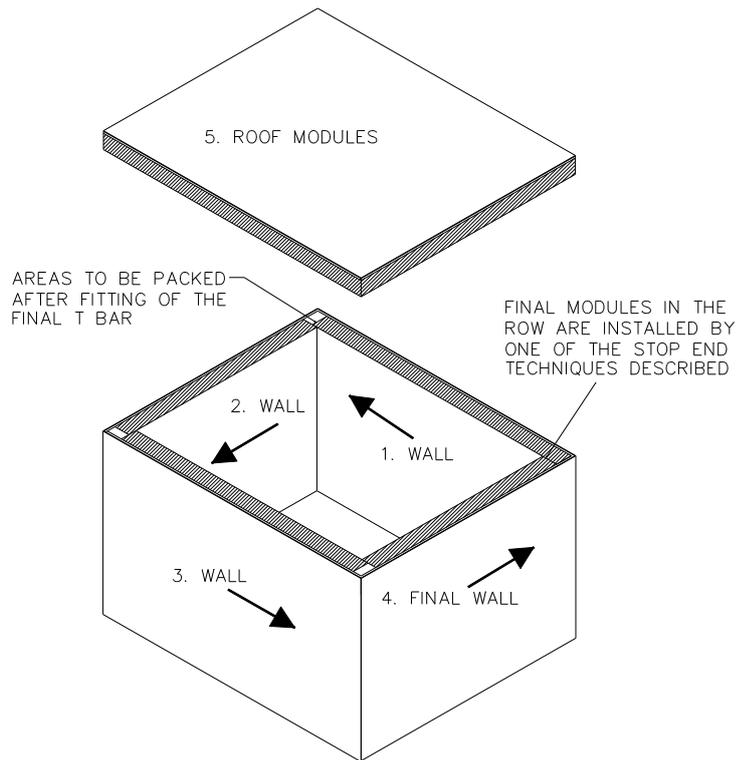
Installation Sequence for a Four Fixed Wall and Roof Application.
